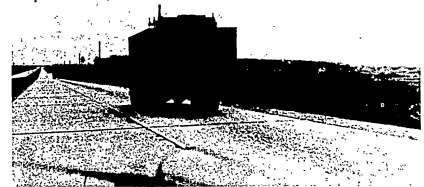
Center Section TTP Ponton W/Typical Load Of Steel Balk And Chess. (U)
